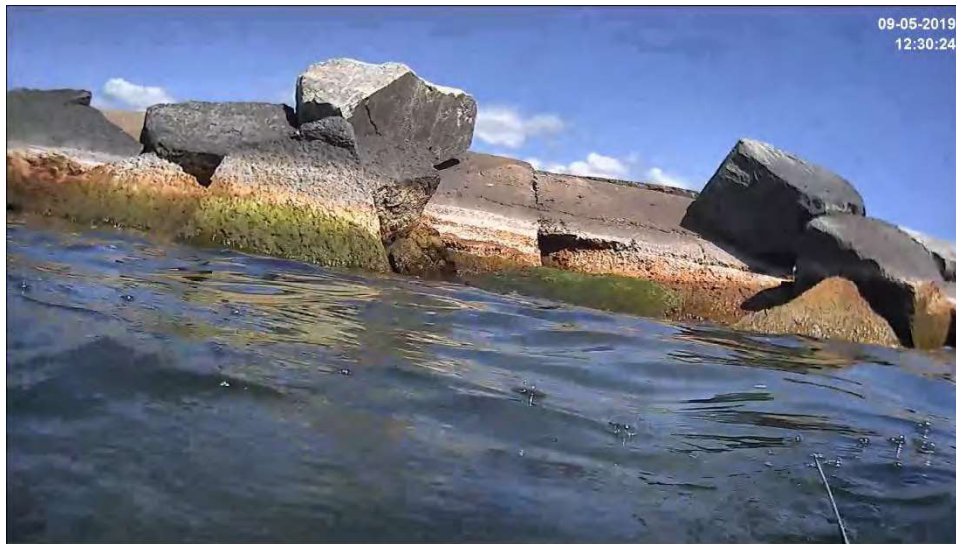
West Breakwater South Side, Small Gap Onshore 0+30
